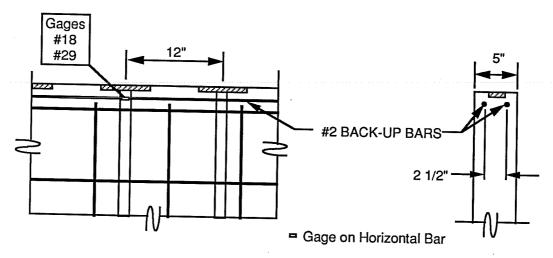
Slab #3 Detail @ Anchors K & L Back-up Bars with Gages
